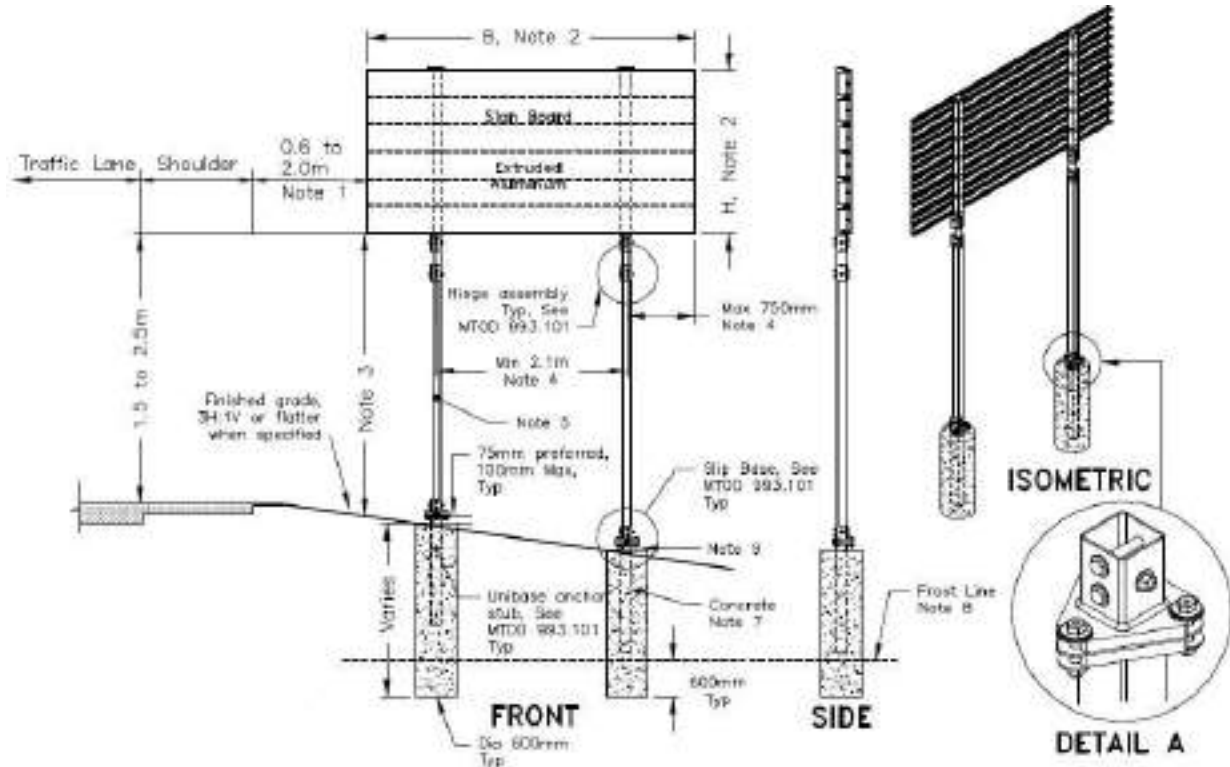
XX: Double Post Assembly of Highway Gator Sign Support Breakaway System
